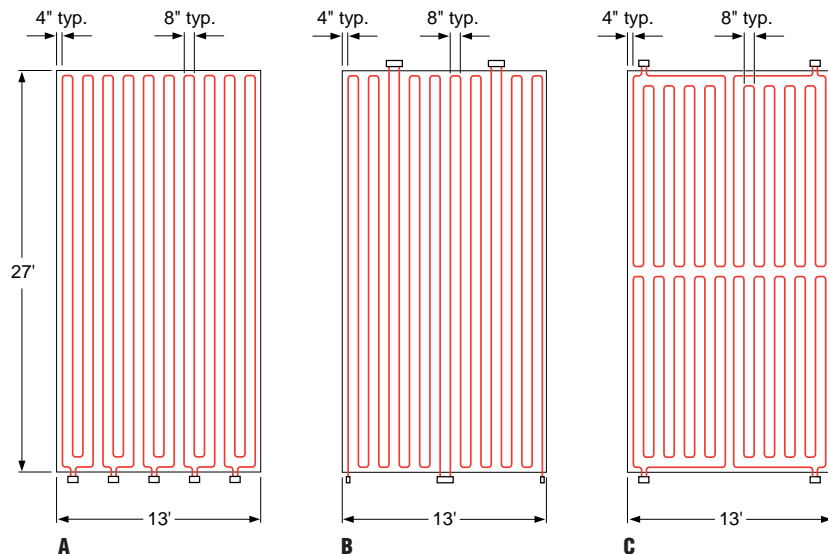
Typical layouts for heating cable attached to the bottom of concrete floors (for typical conduit layout, refer to Figures 5.2 and 5.3 on page 27)
